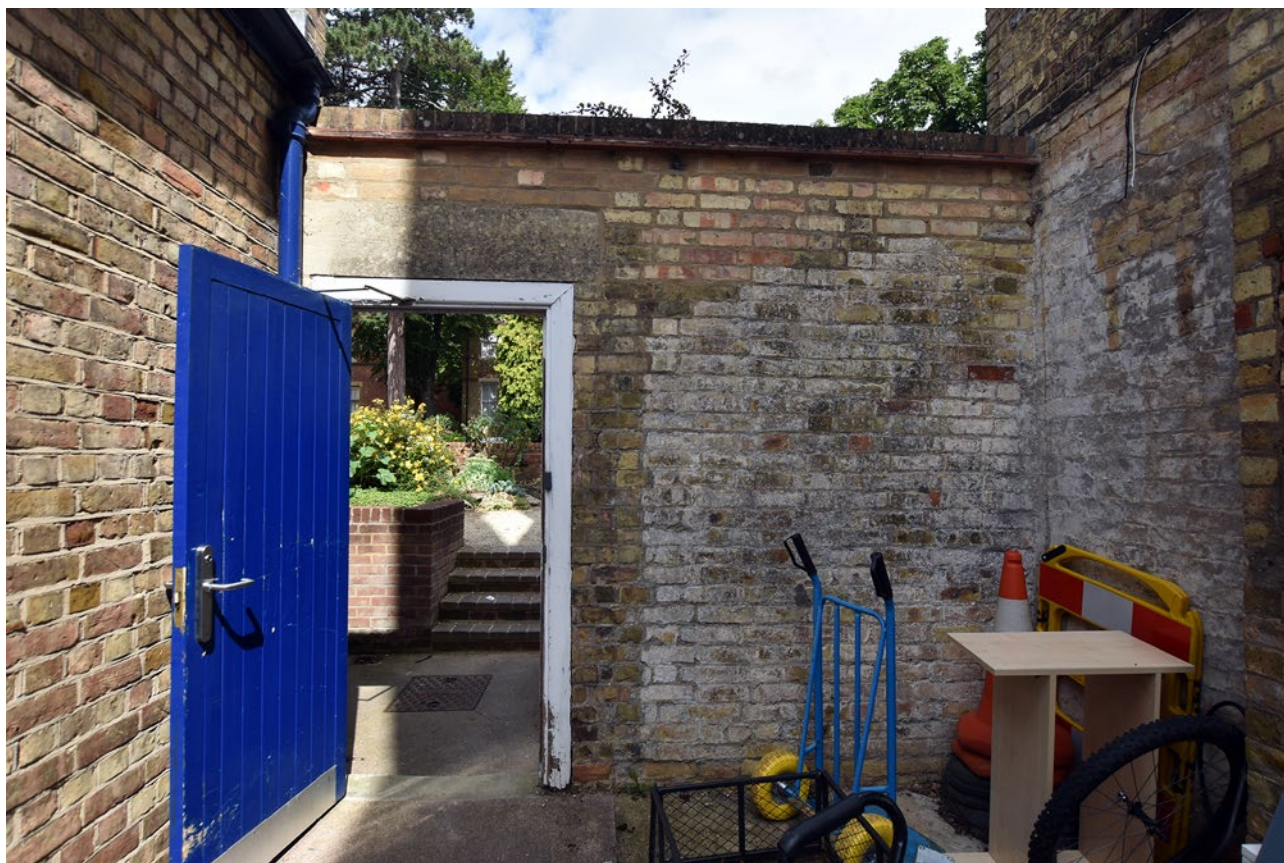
The south elevation of the courtyard wall between the chapel and main house
